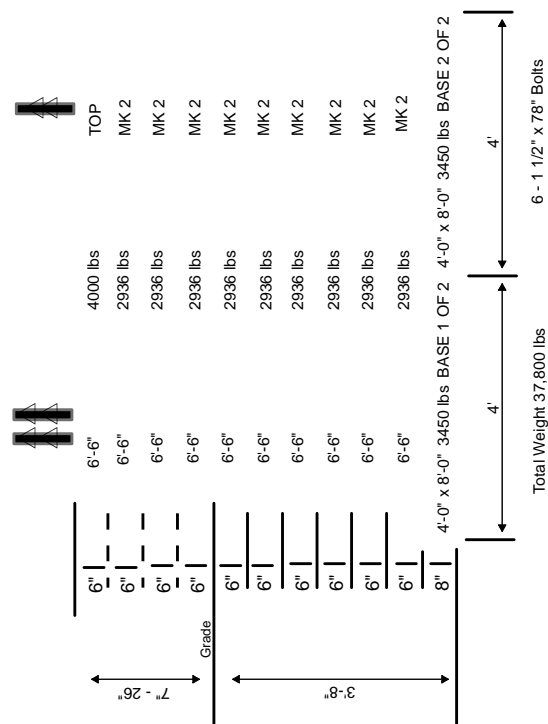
RDT Stacking Slab Tower Foundation Schematic
